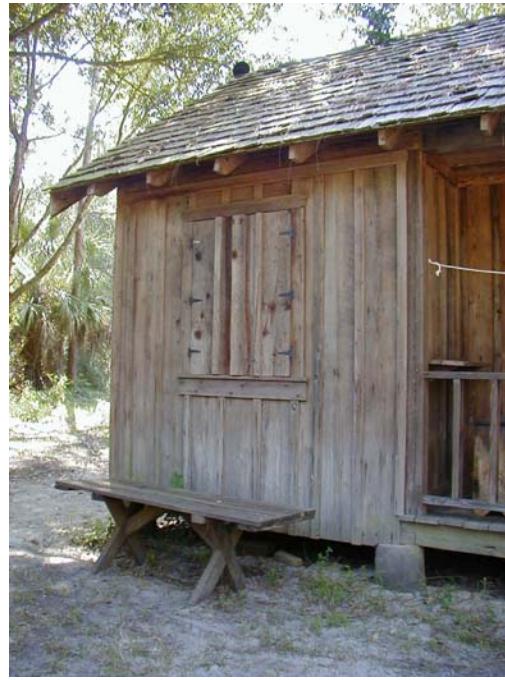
Kitchen window of addition to Hogan's cabin, Morningside Park, Gainesville, Florida. Simple shutters cover the opening when light and ventilation of the room are not necessary, but a splayed head for the window framing echoes Greek Revival architectural detailing practices transformed by vernacular ideas.
